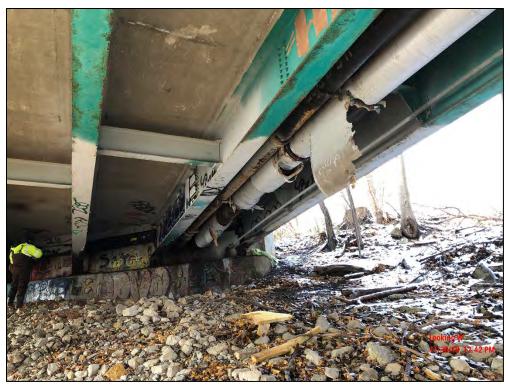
Deck underside configuration West Span. Failed pipe insulation in north bay.
